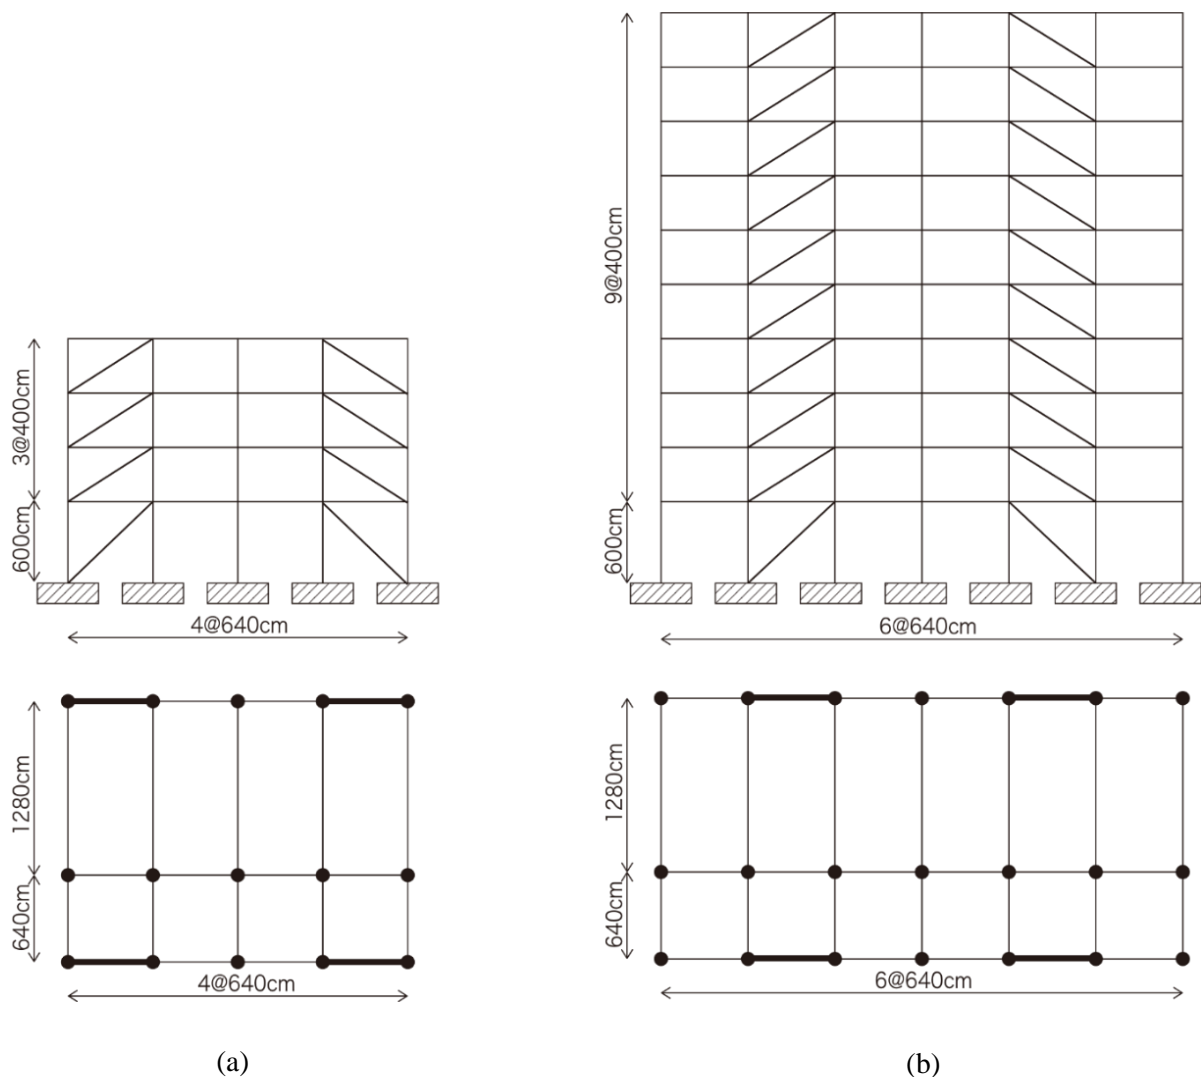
Targeted Buildings plan and elevation for Oil damper Configuration;
